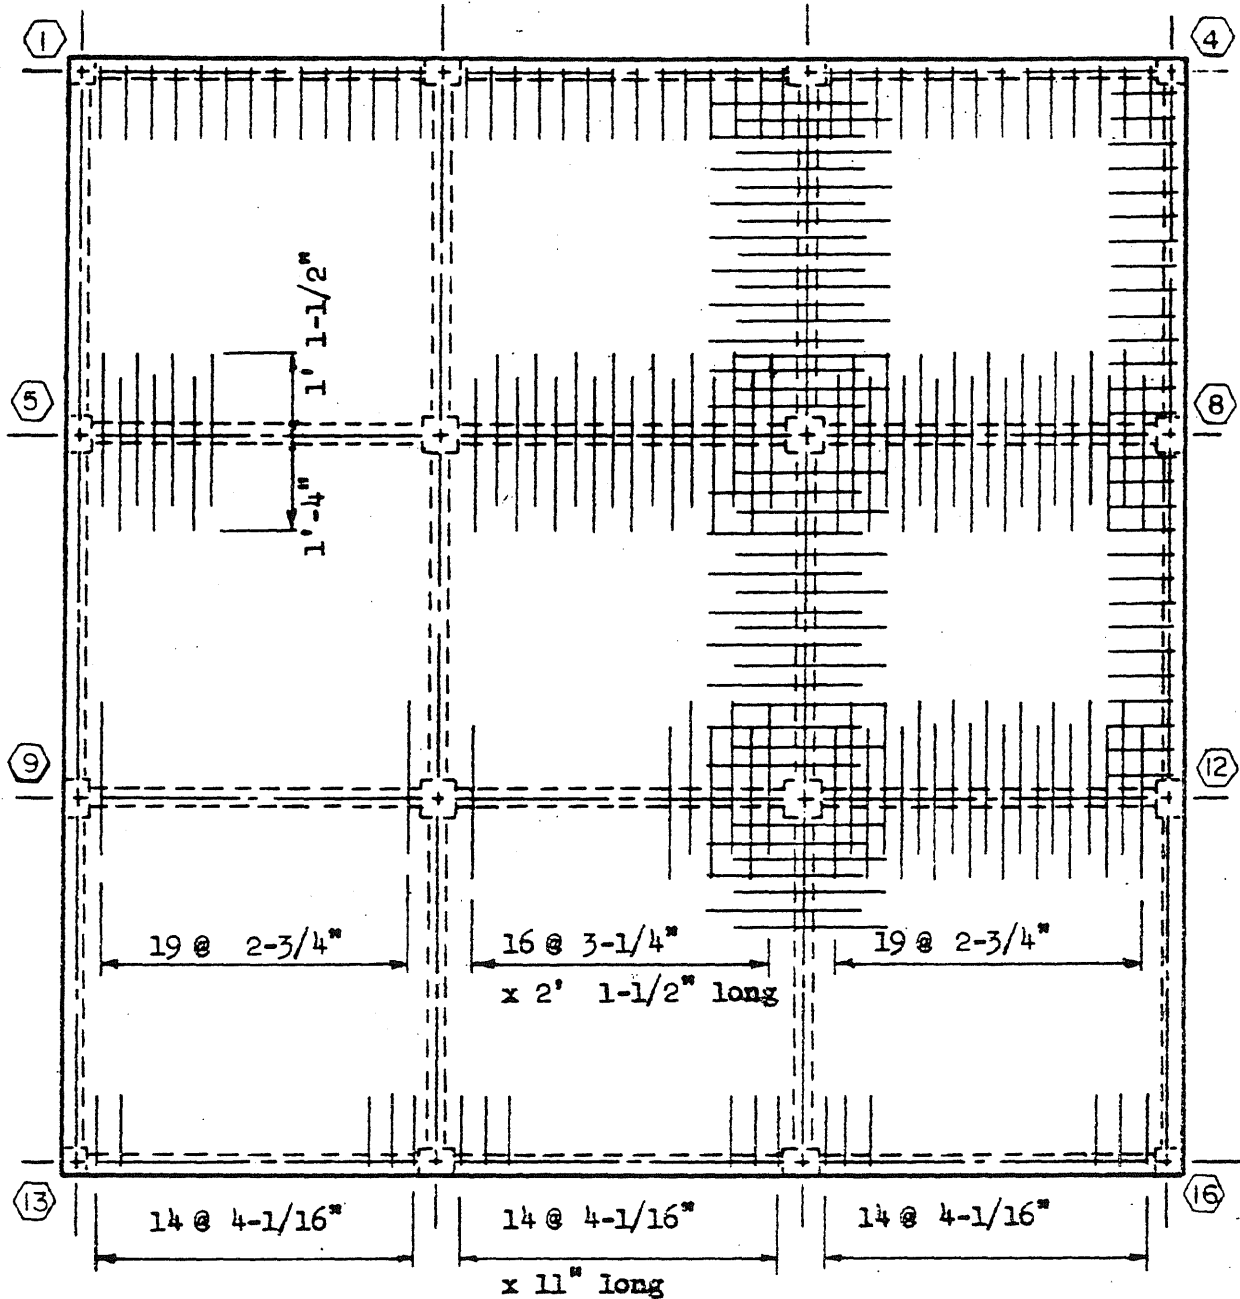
LAYOUT OF TWO-WAY SLAB TEST STRUCTURES (T1 , T2)
